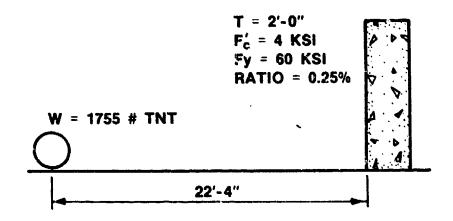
Layout of Experiment 2 scaled up for comparison with existing control-room wall.
